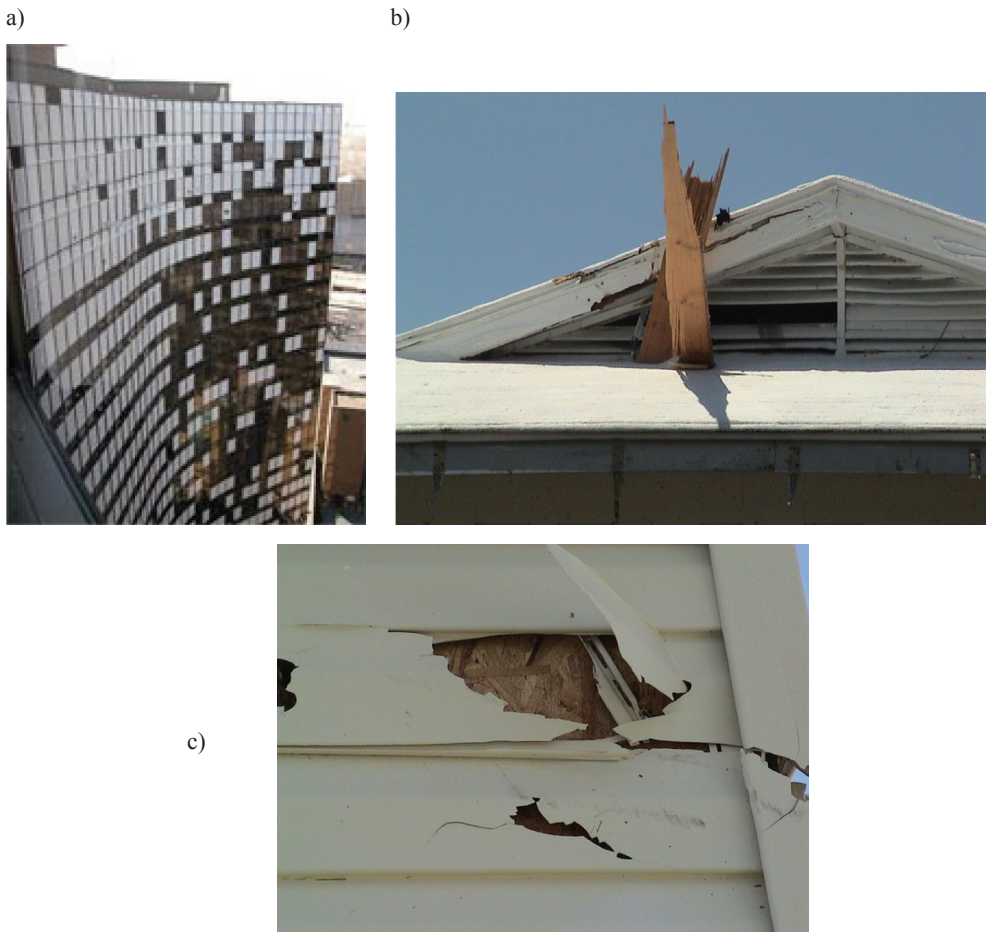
Examples of damage caused by windborne debris, a) north façade of Hyatt Hotel, New Orleans damage by pea gravel from neighbouring roof (photo by K. Porter for MCEER), b) example of hazard due to missiles generated by failed structures (photo by T. Reinhold, AAWG gallery), c) example of cladding damage due to windborne missiles (photo by T. Reinhold, AAWG gallery)
